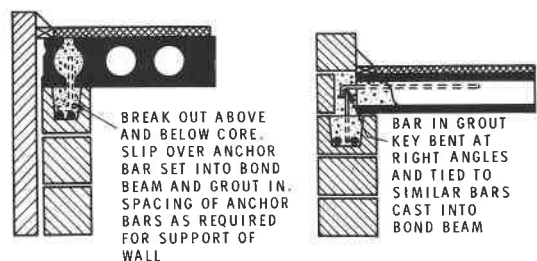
Standard edge details (at roof level) (Con-Force 1974) (published with the permission of Con-Force Products Ltd.).
